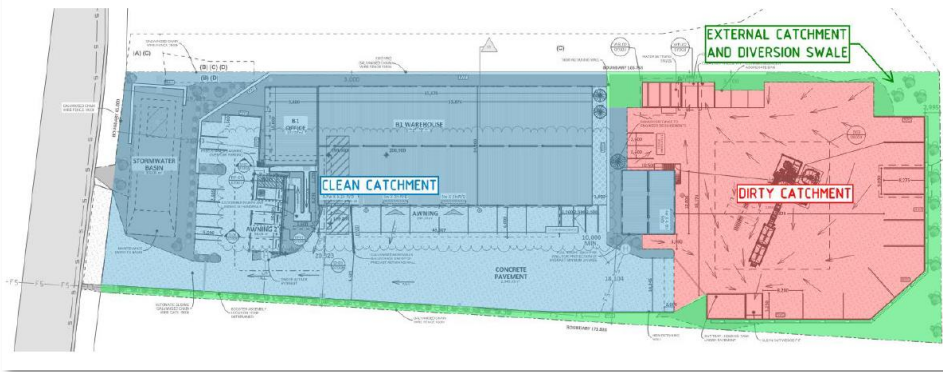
Site Catchment Separation Schematic (Source: Northrop)
